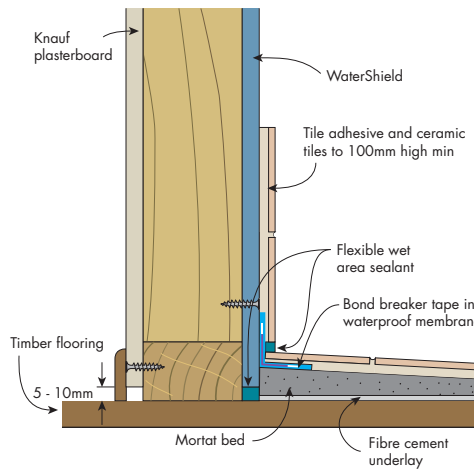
Wall Base in Wet Areas (Outside Shower)
